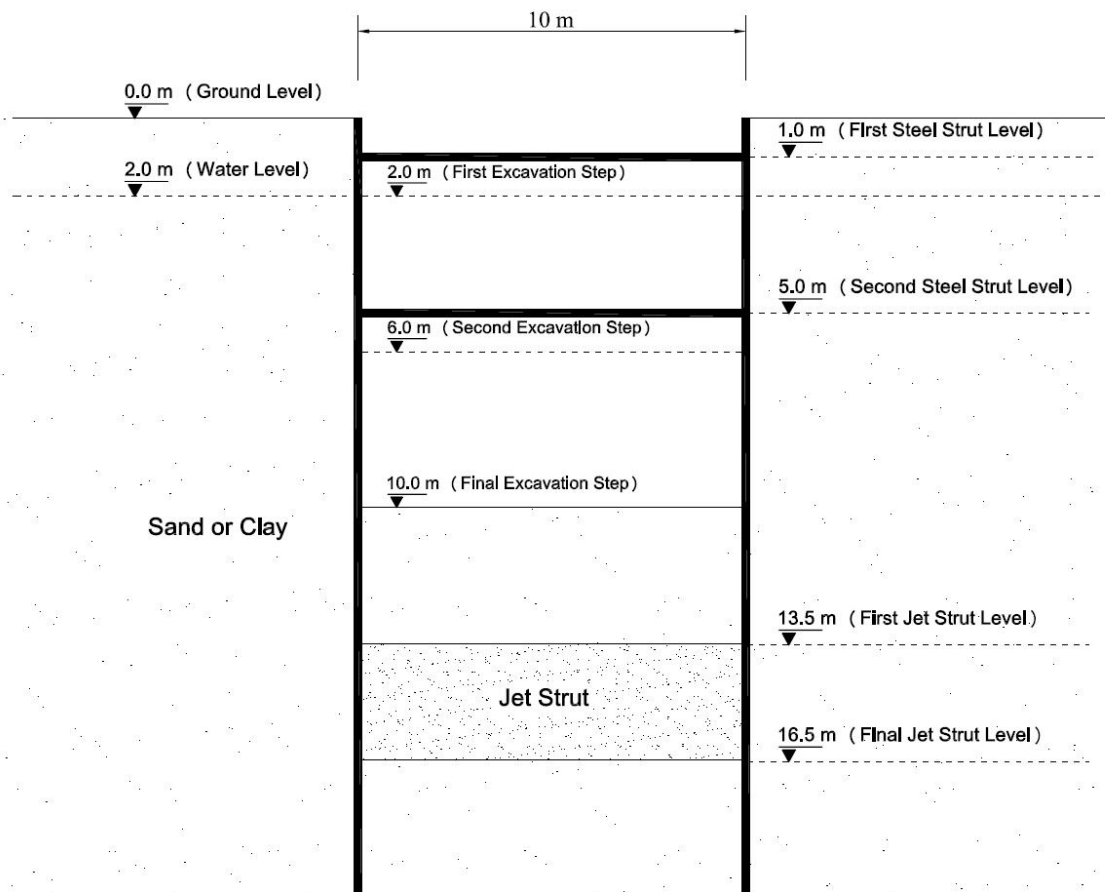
Jet Grouting Strut Location III: Jet struts between 13.5 m and 16.5 m
